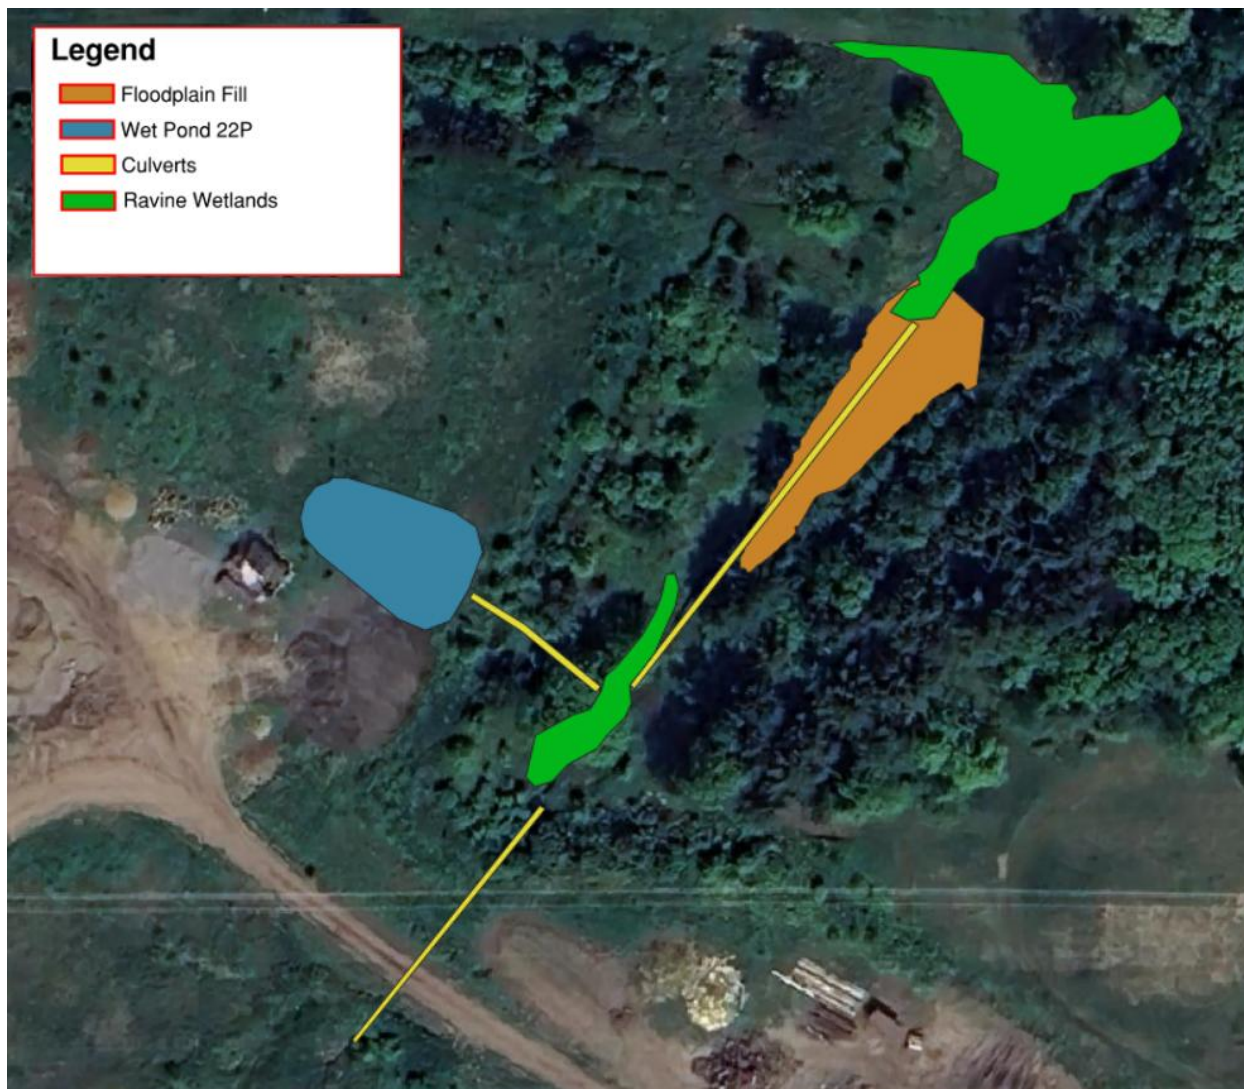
Floodplain Fill and Replacement Storage at Wet Pond 22P
